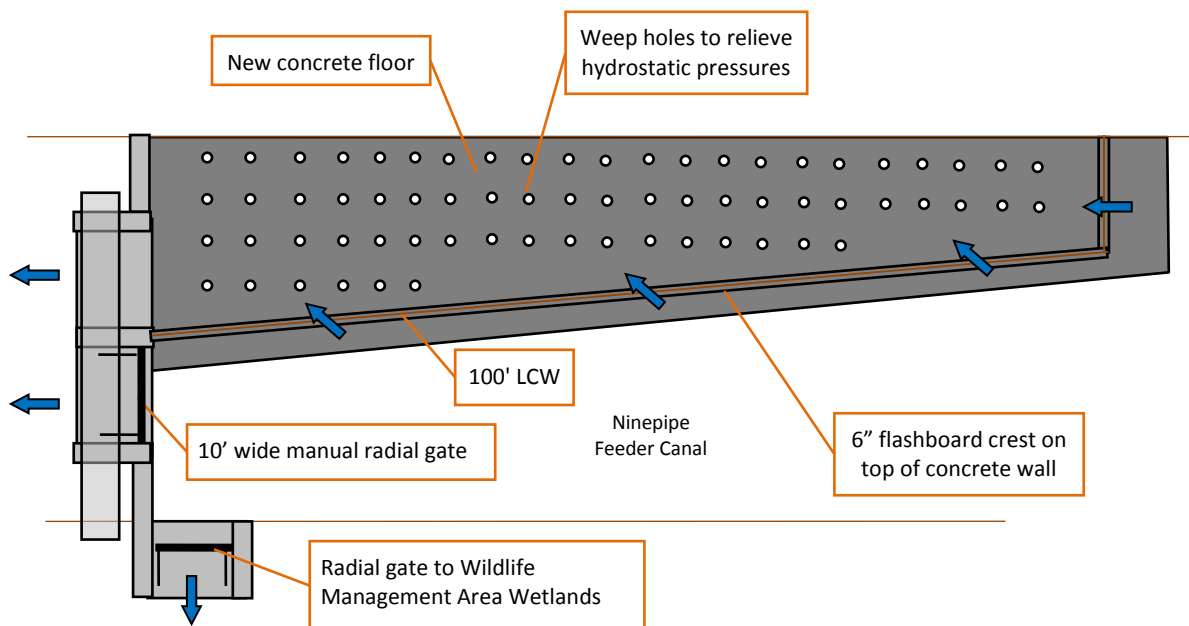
Conceptual plan view of new LCW design at the first Ninepipe Feeder Canal check structure
